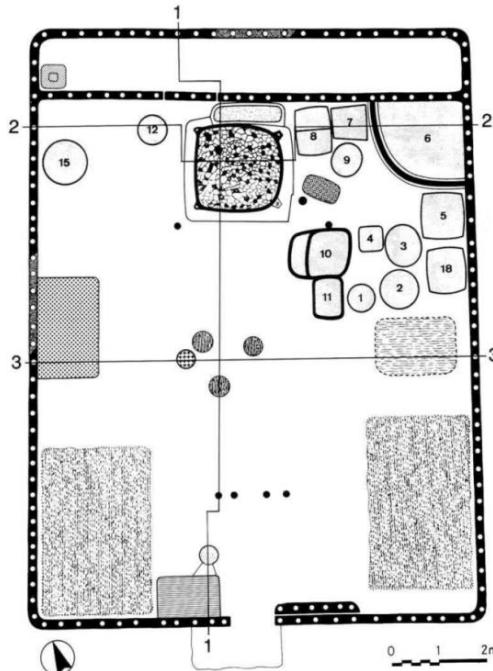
Slatina Sofia. Plan of the building (after Nikolov, 1989: 44, fig. 24).
